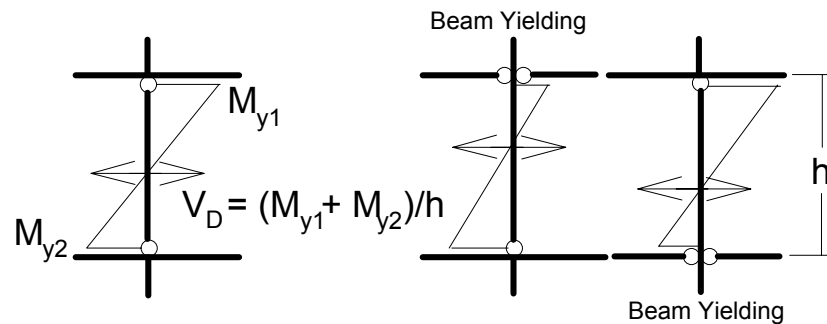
Calculation of column design shear in 1971 AIJ RC Standard.
